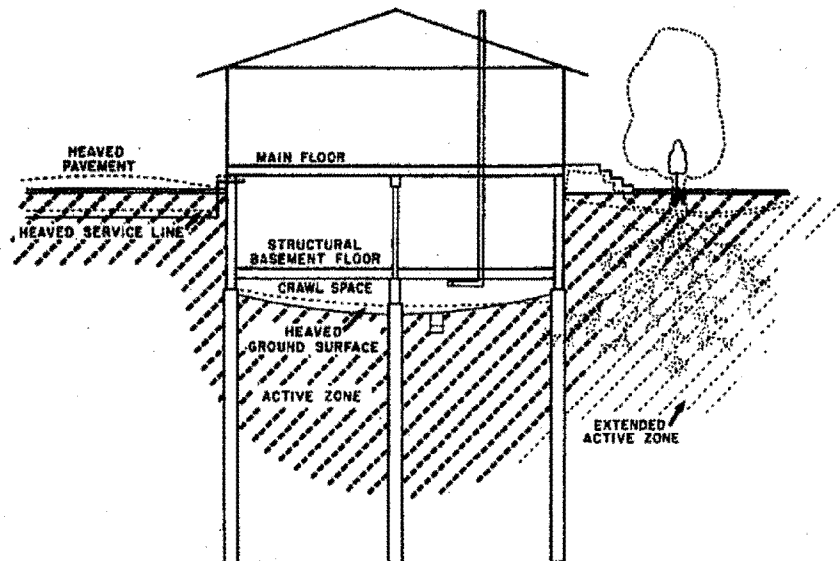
Deep Foundation System and Suspended Basement Floor Slab
